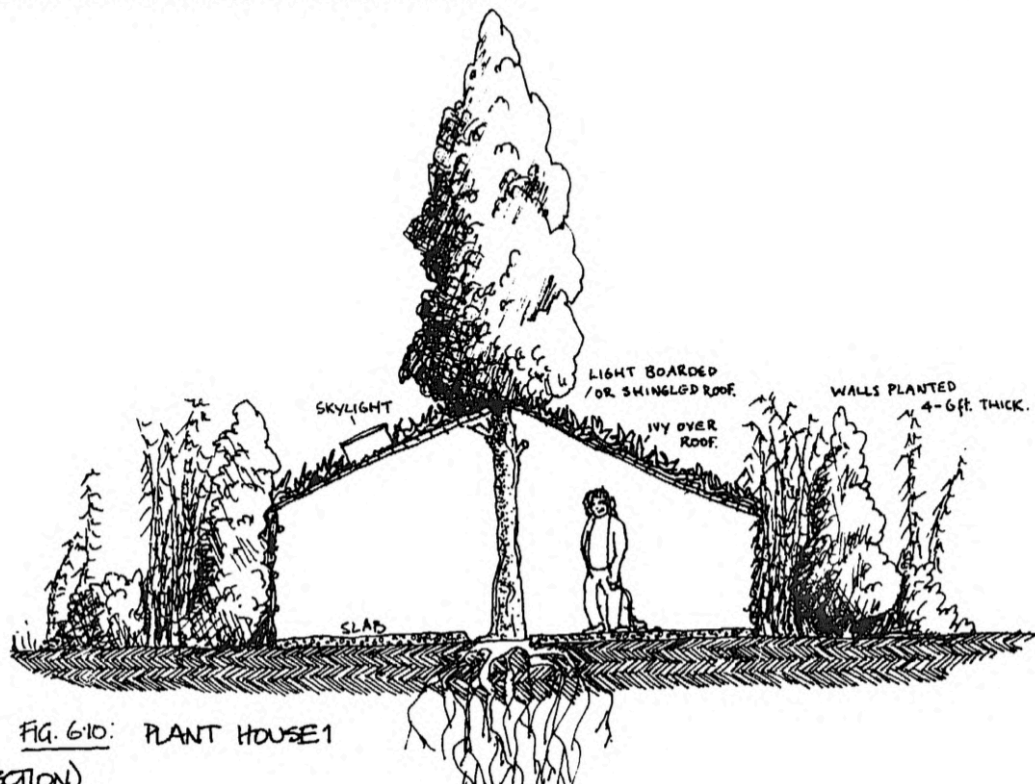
PLANT HOUSE 1 (SECTION).
